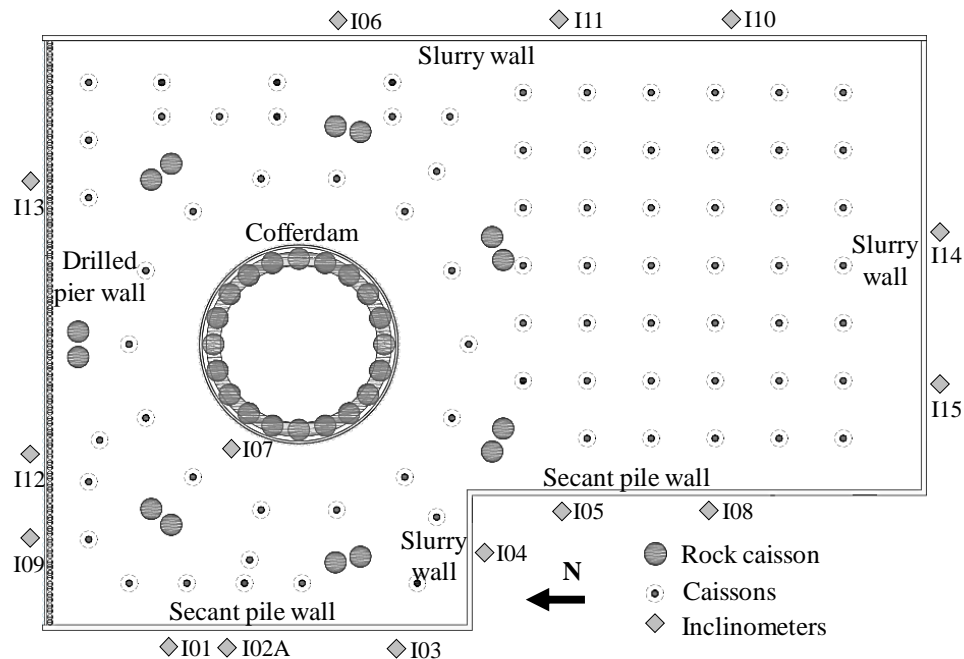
Chicago Downtown Cofferdam plan with foundation distribution, retaining structures and instrumentation.
